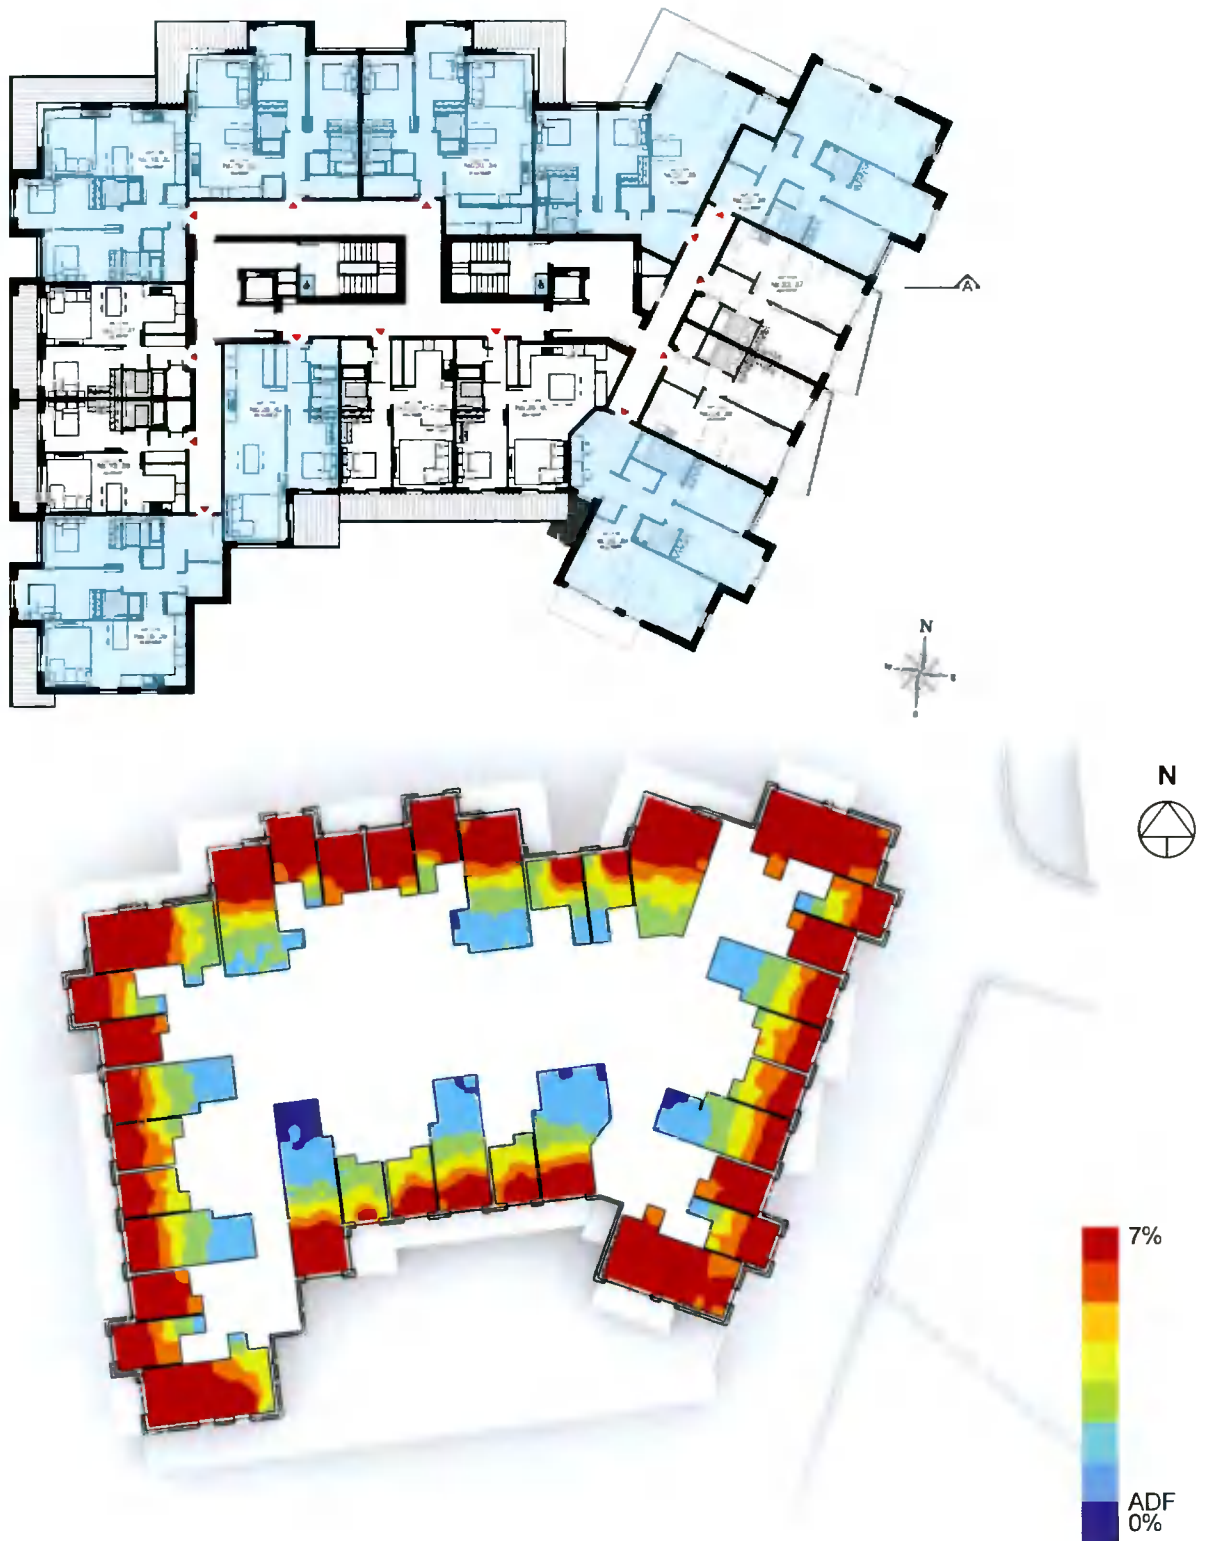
Second floor plan locating rooms assessed for ADF, together with false colour plans of ADF. Scale 0 - 7%
